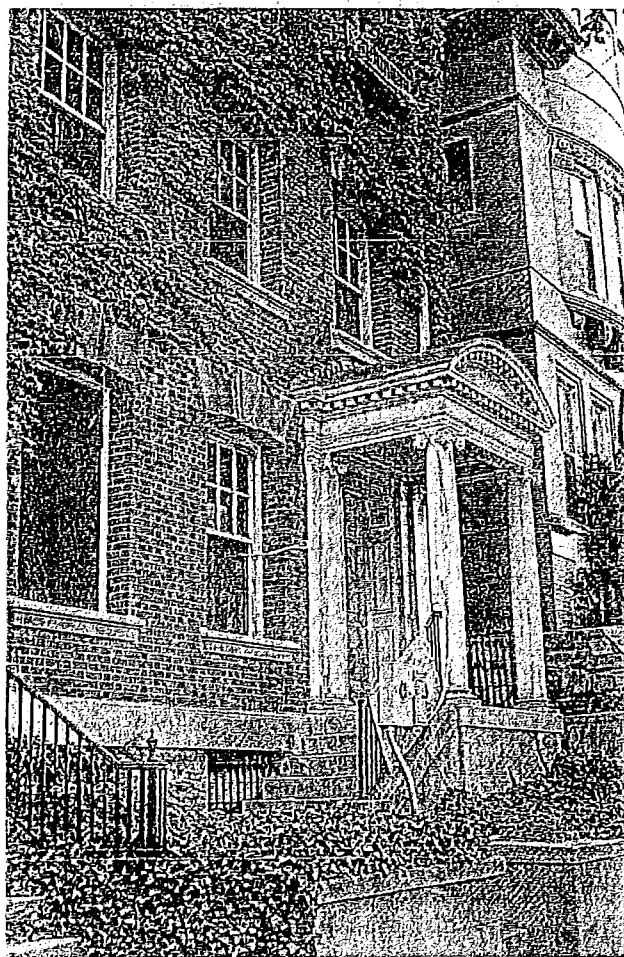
All systems except temporary electric have been shut off at this residence which has been mothballed over 20 years. An electric meter and 100 amp panel box have been set on a plywood panel at the front of the building. It is used for interior lighting and various alarm systems. The building, however, is showing signs of moisture problems with efflorescent stains on the masonry indicating the need for gutter maintenance and additional ventilation for the interior. The vegetation on the walls, although picturesque, traps moisture and is damaging to the masonry. Photo: H. Ward Jandl, NPS.
